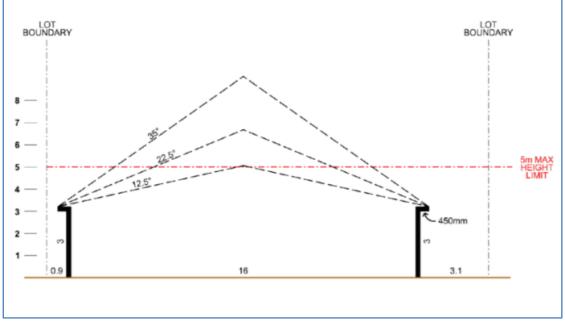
A building envelope plan of single storey dwellings and their expected building height based on the proposed roof pitch.
